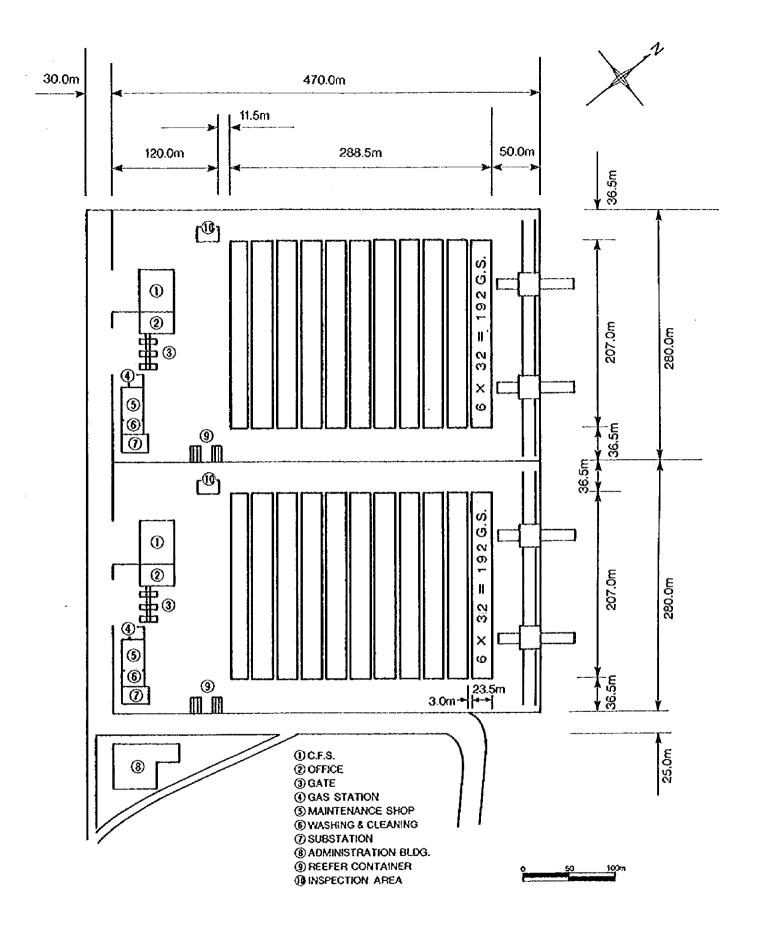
Port Layout for Short Term Plan (New Container Terminal)
